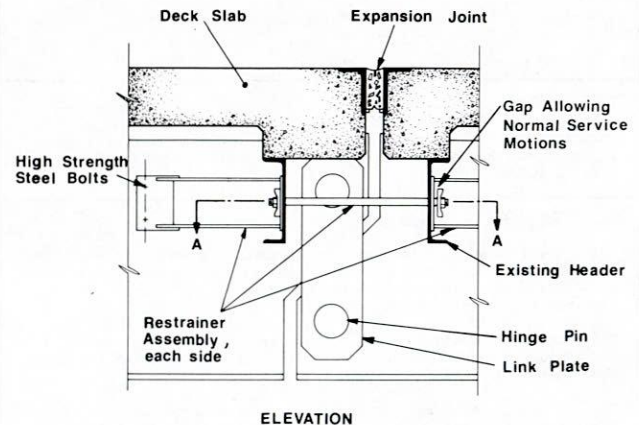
Steel Girder Bridge Hinge Expansion Joint Longitudinal Restrainer
